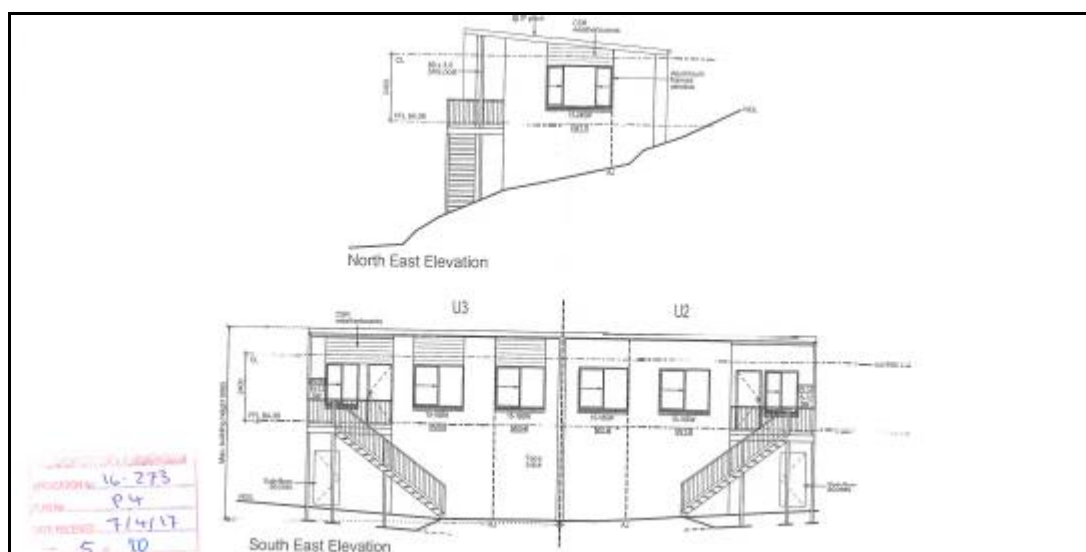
Proposal Plans - south and east elevation - Units 2 & 3 - Wilson Homes
